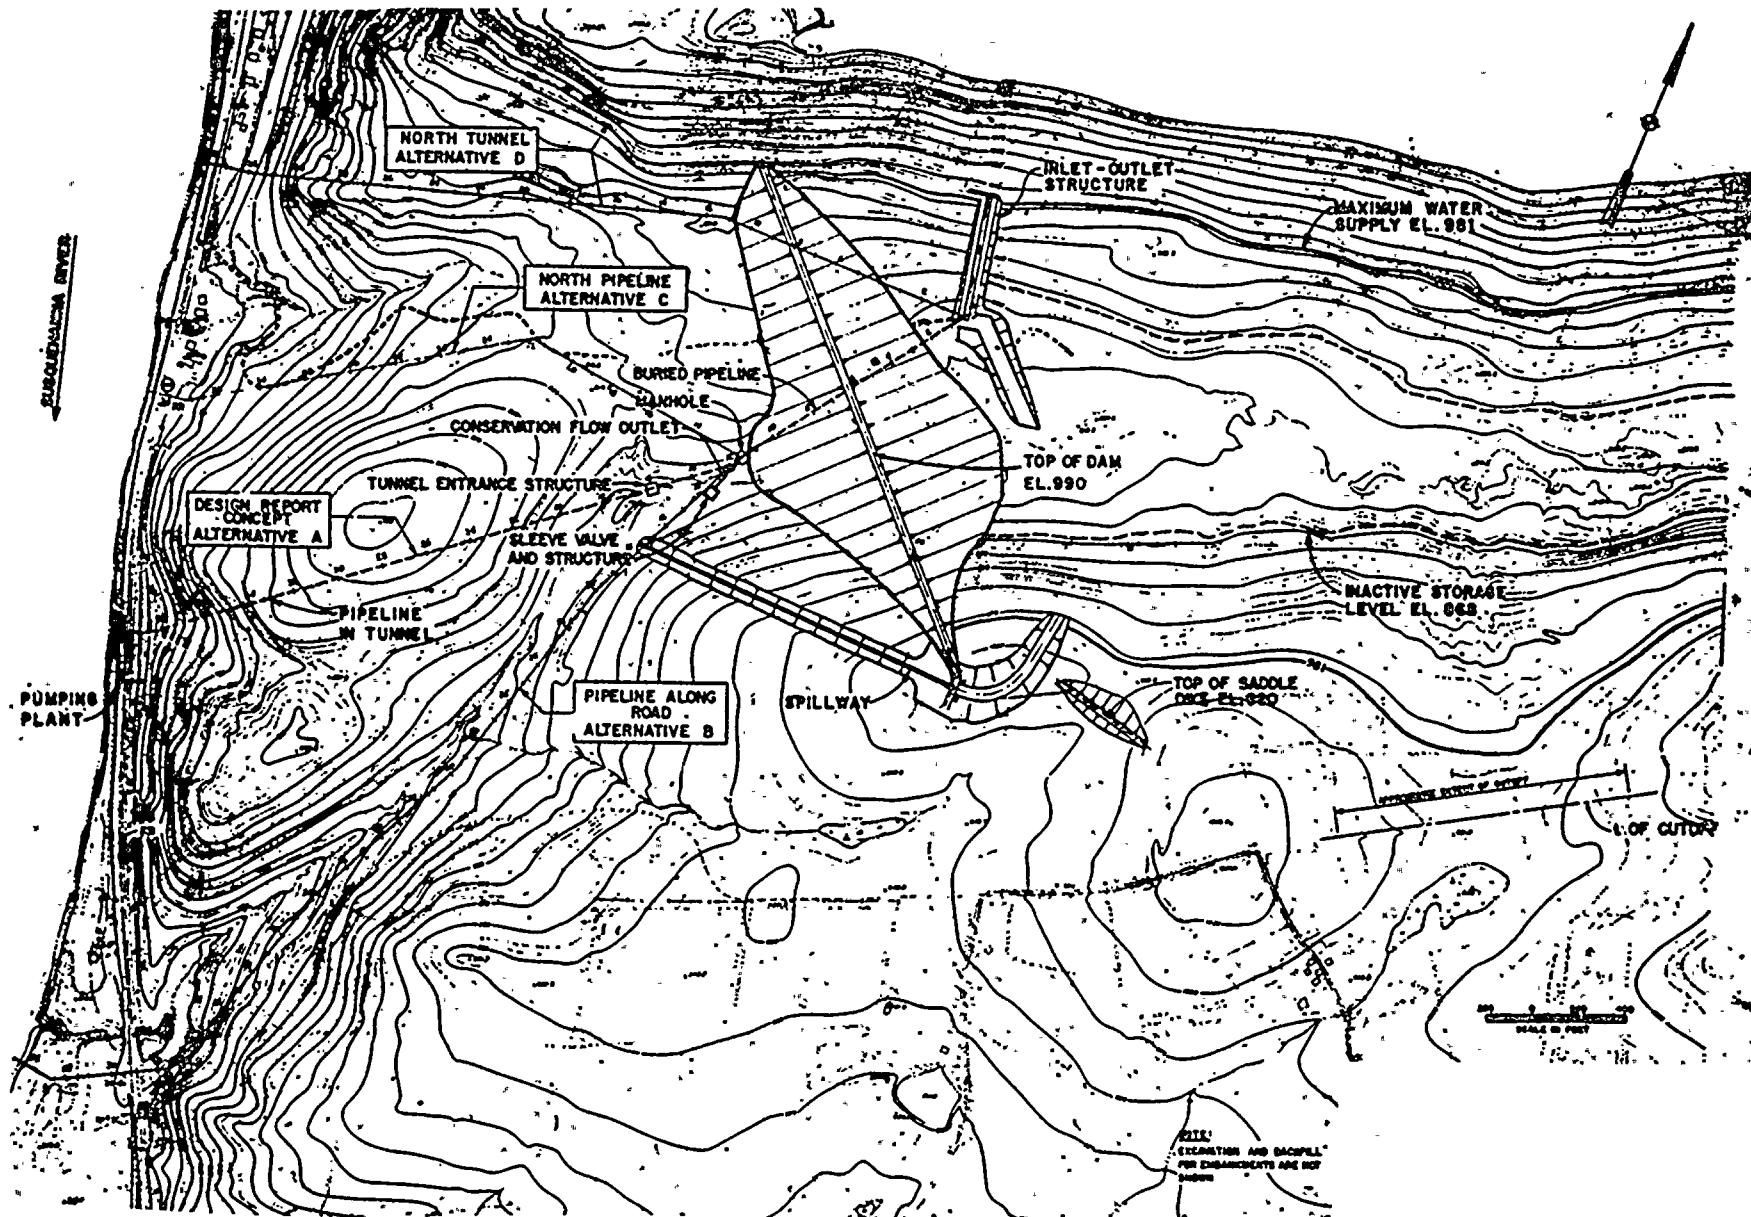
General Project Plan for Pond Hill Reservoir with Alignment of Alternatives. (Source: Reference 1)
